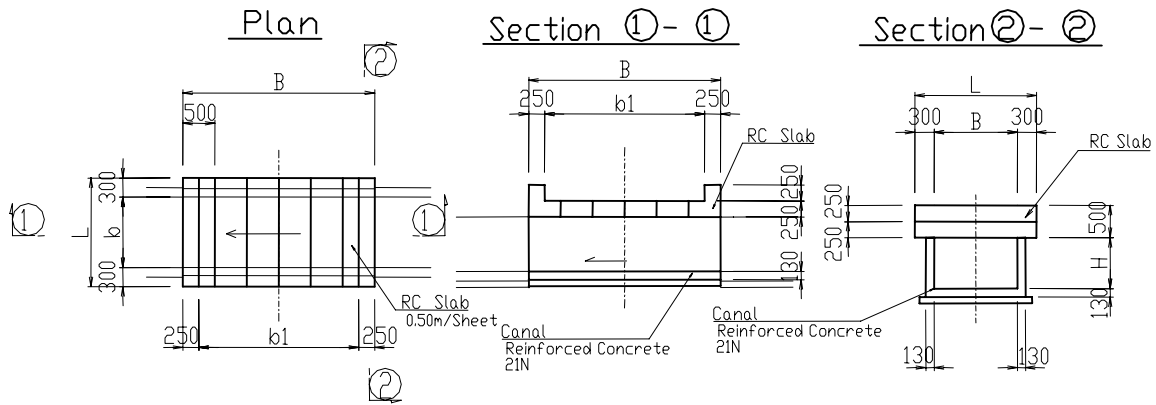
Structure of RC Slab Bridge
